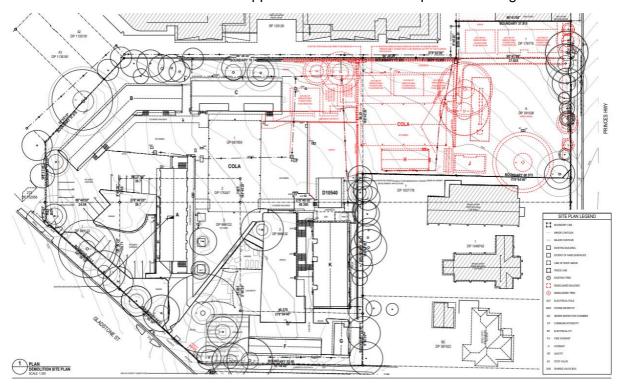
Demolition Plan (Fulton Trotter Architects, 2025)
